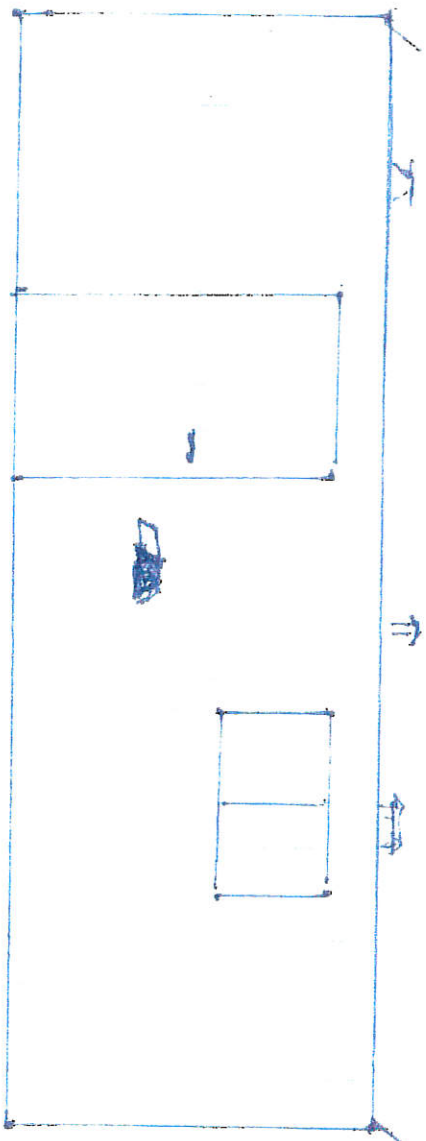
APPLICATION, SITE PLAN, ELEVATION
